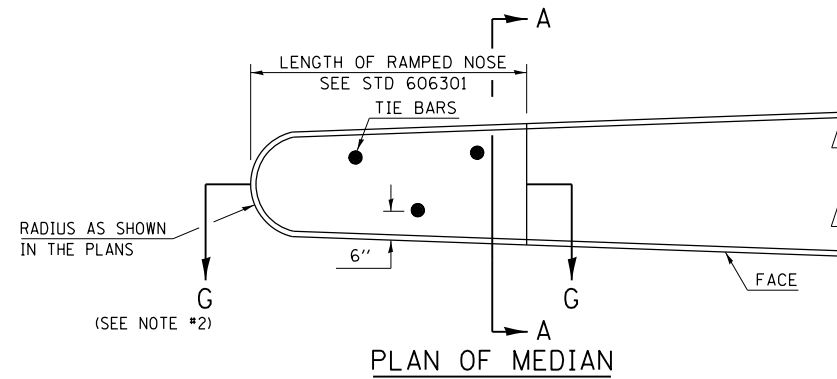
# DETAIL OF CONCRETE MEDIAN, TYPE SB-6.06 (DOWELLED)
